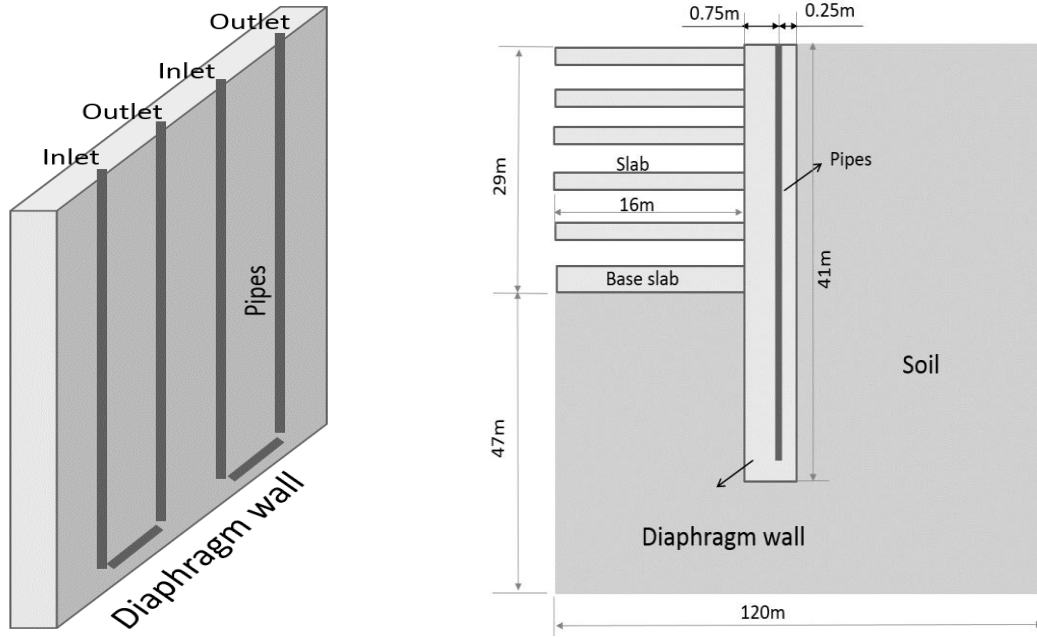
Section plan drawing of geothermal heat exchangers embedded in a diaphragm wall.
